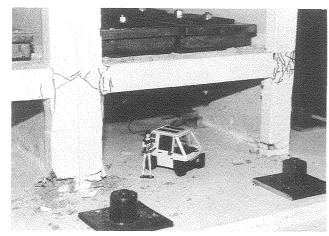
Cracks at First Story (Plastic models are 1/20 scale)
